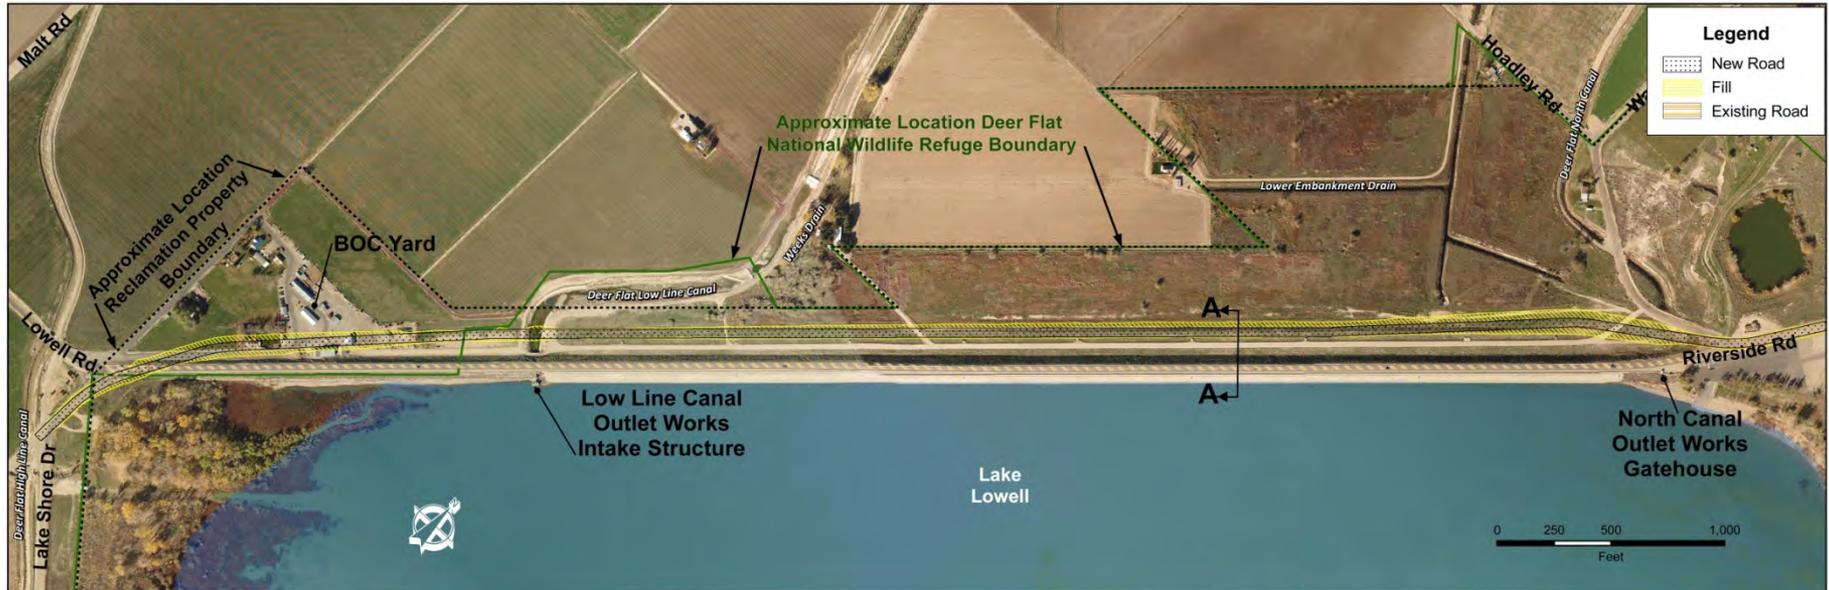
Alternative C: Close Dam Crest/Relocate Riverside Road to Downstream Toe
